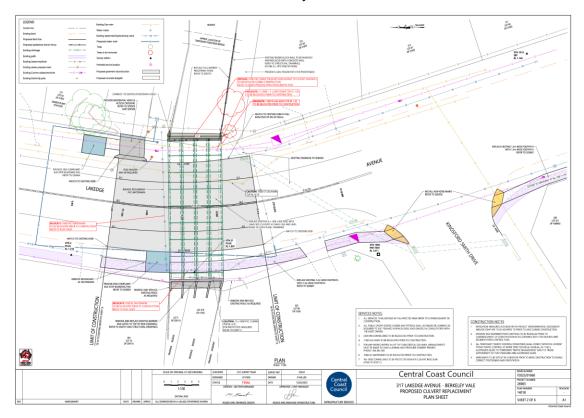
317 Lakedge Avenue culvert replacement detail design plans
